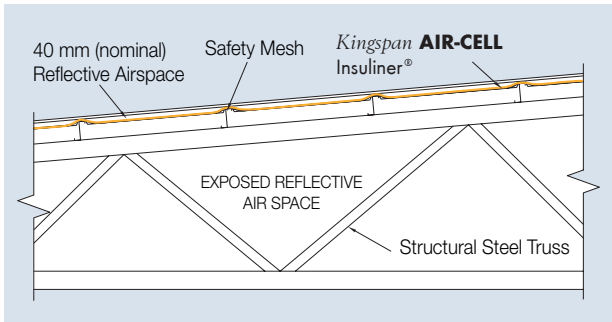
Side elevation of *Kingspan AIR-CELL Insuliner®* in a warehouse metal deck roof
